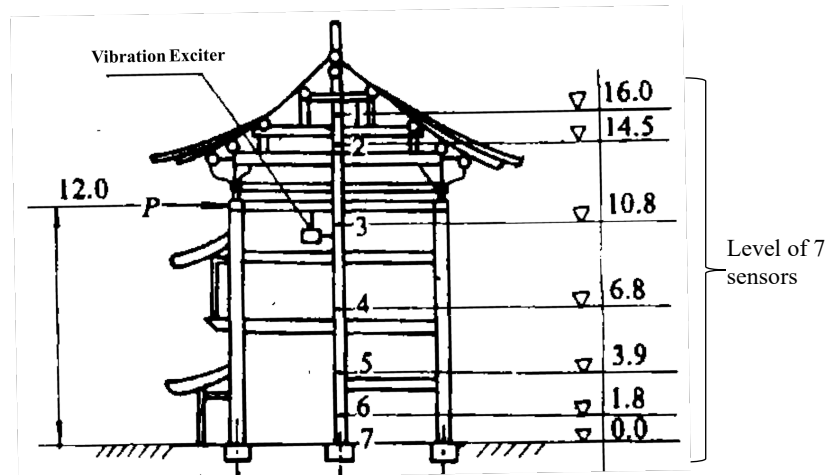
Elevation of the Front Tower over the North Gate of the Xi'an City Wall (Yu et al., 1986)
